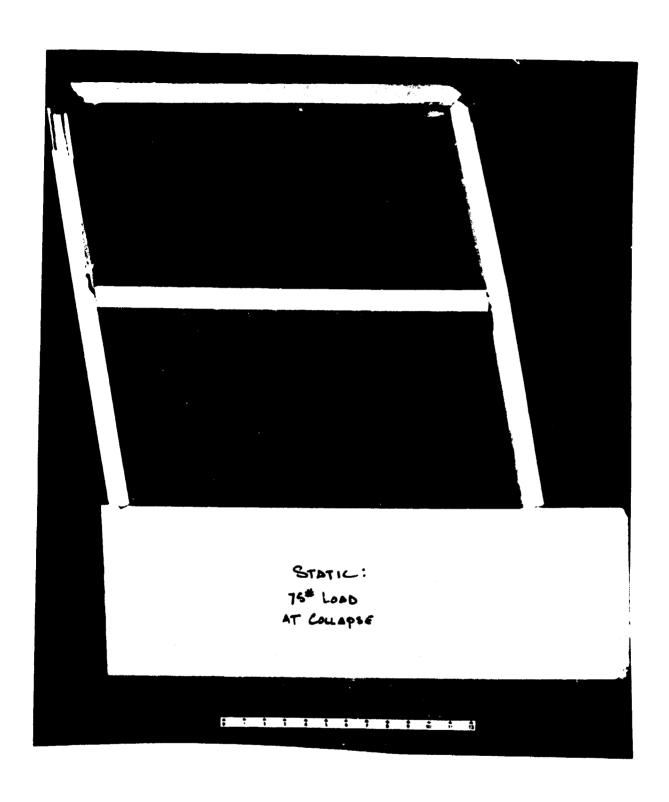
STATIC COLLAPSE, TWO-STORY FRAME
